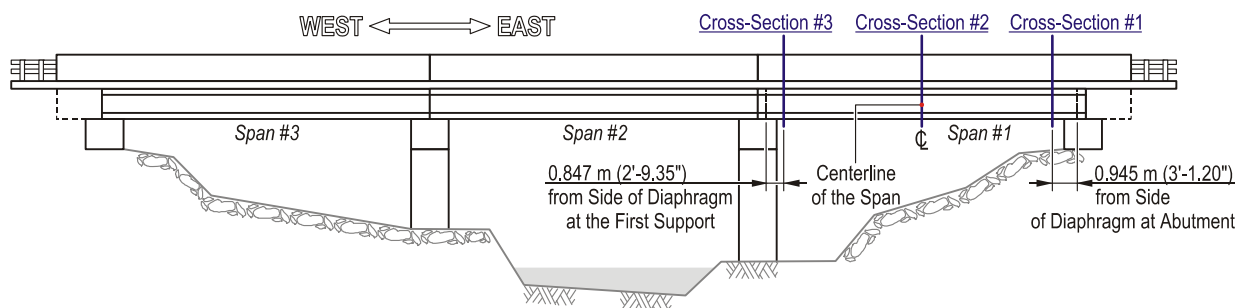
Location of the instrumented cross-sections for the tested bridge
